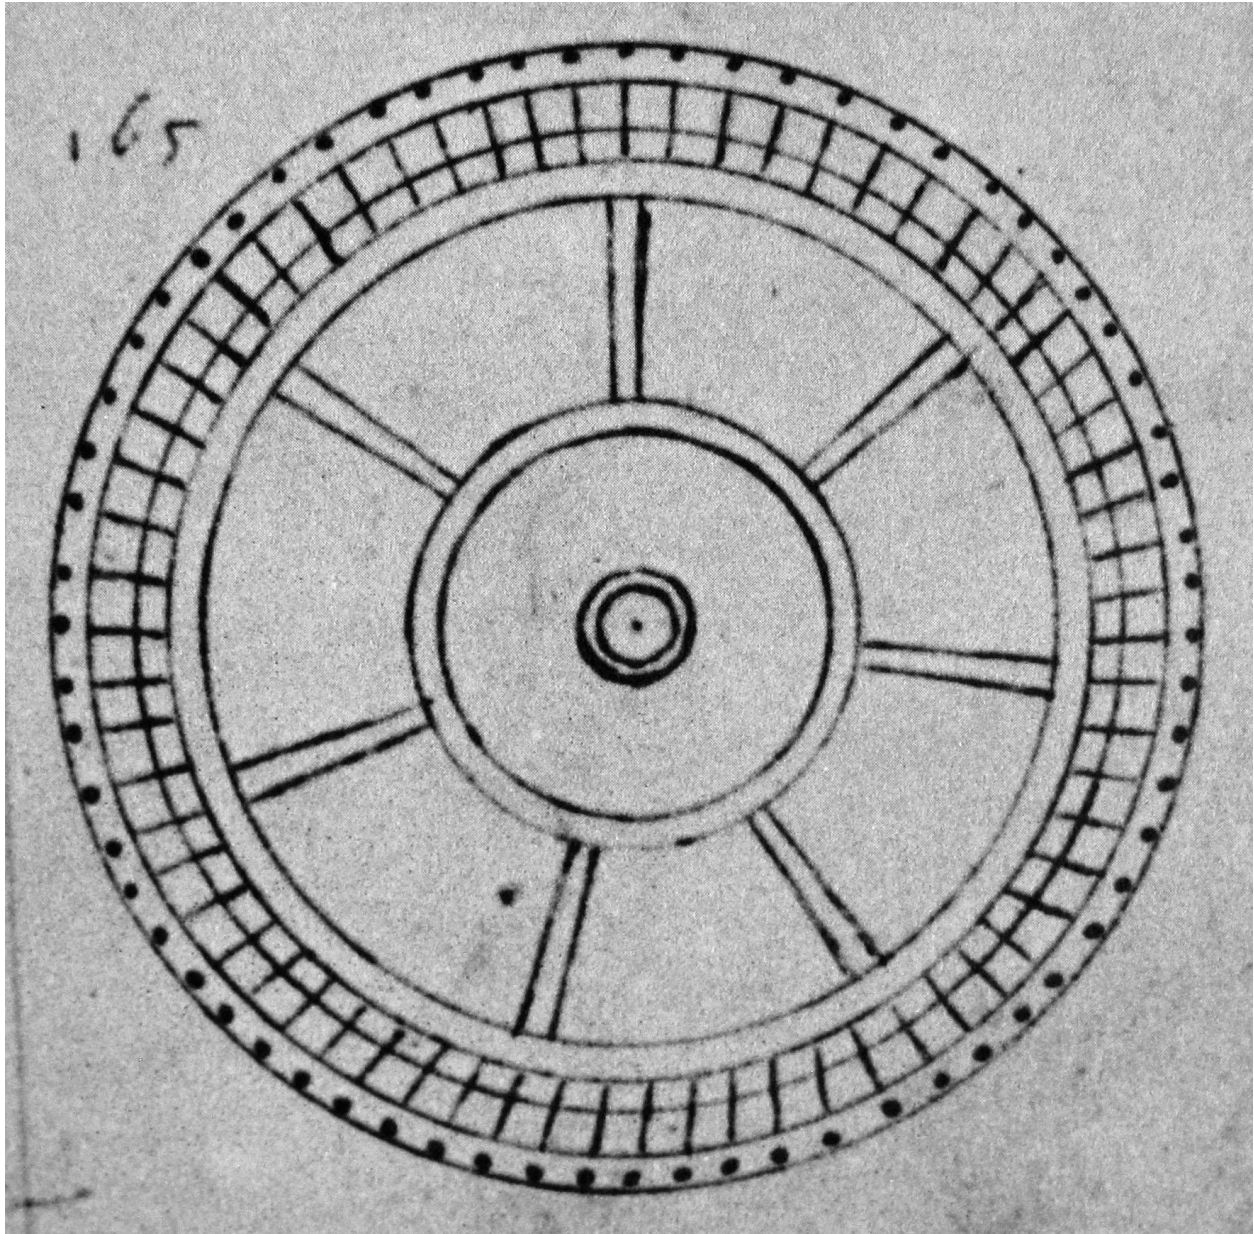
House of *Virtù* and Vice, tower plan (Magl., 145r)
